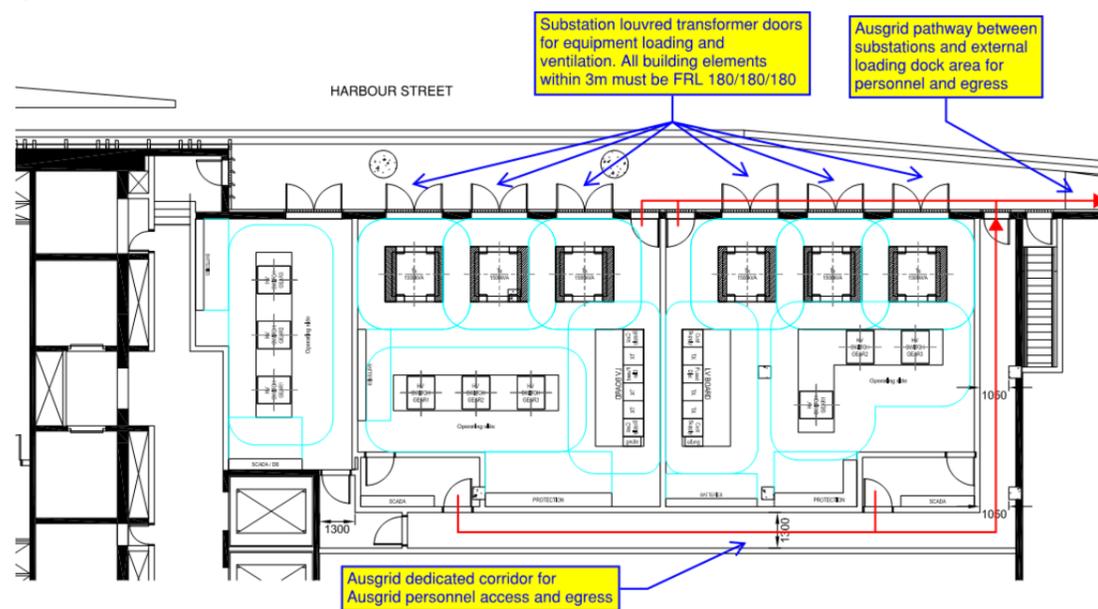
Substation 1 & 2 Chamber Location & Spatial Layout, Level 00
